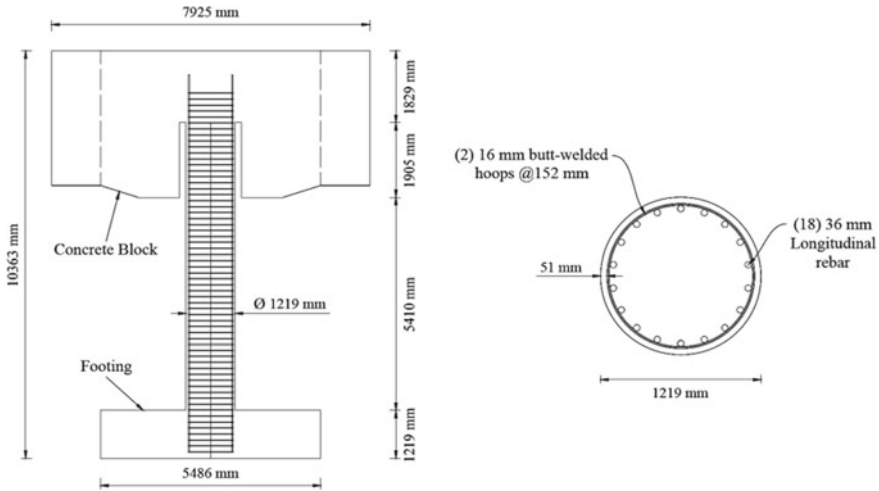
Bridge Bent configuration and geometry and cross-section of the column
